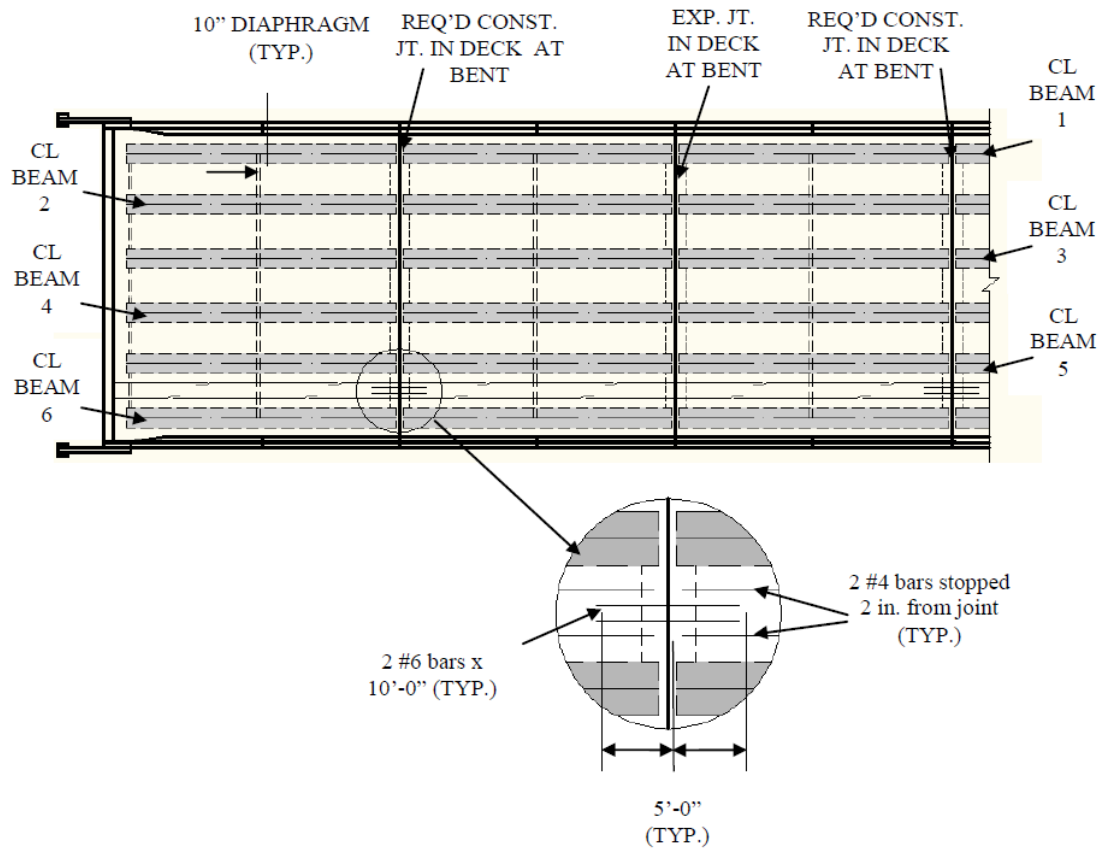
Plan view of current continuous bridge deck (SR 46 Over Oconee River)
